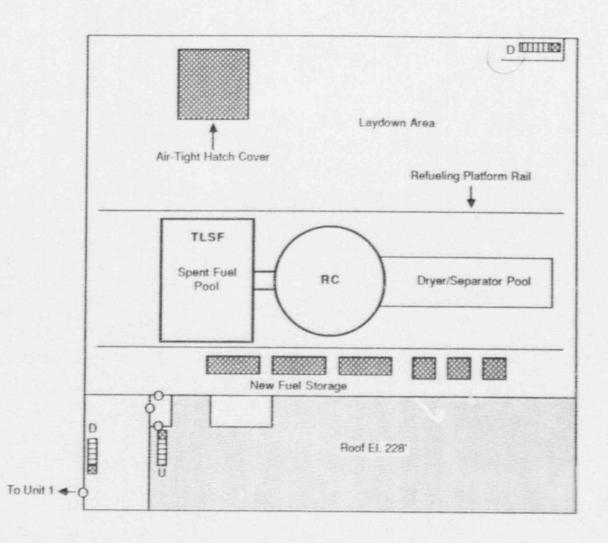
Hatch Unit 2 Reactor Building Arrangement - Elevation 228 ft.
